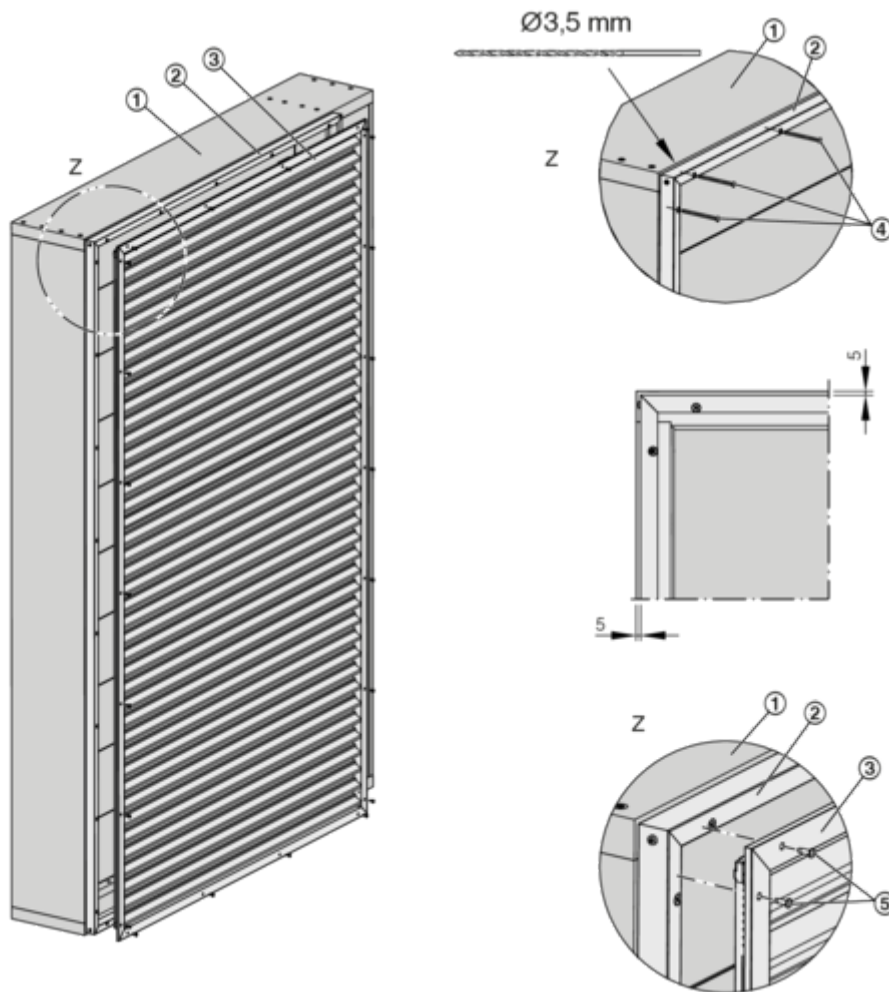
Mounting aluminium grille with slanted blades on EK-JZ
